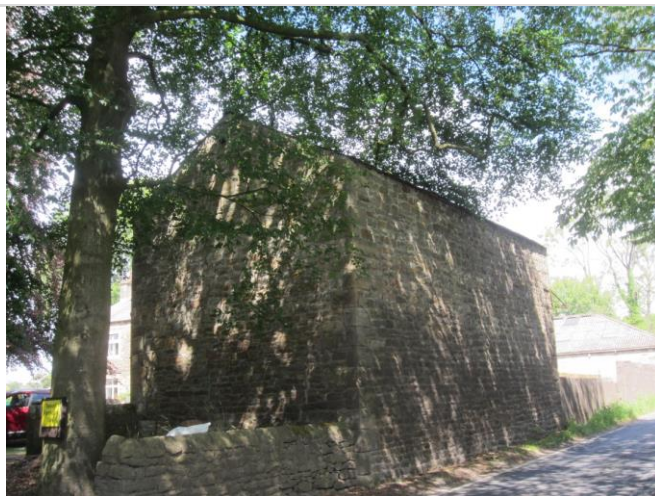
Southern and eastern elevations of the detached barn, adjacent mature Beech tree and Slaidburn Road
